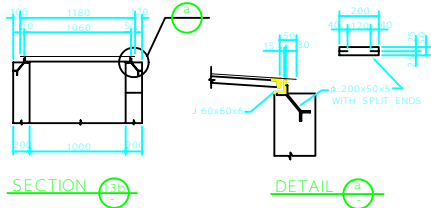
DETAIL OF INLET MANHOLE COVER (FOR REINFORCEMENT PLAN SEE DETAIL 13c)
